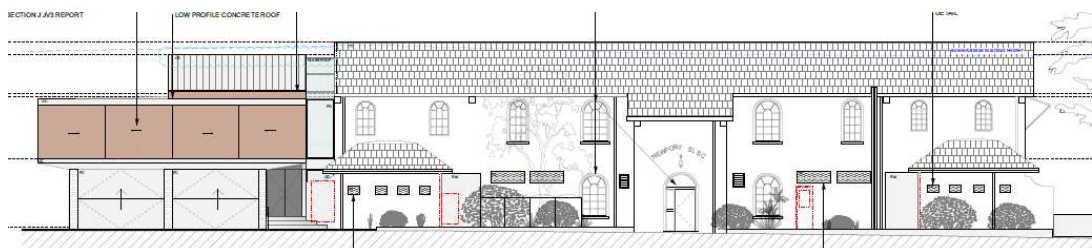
New northern addition utilizing a clearly contemporary architectural character, allowing the original Mediterranean aesthetic to remain clearly discernible. Minor additions to the single-story wings retain the existing roof lines without disruption. (Source: Adriano Pupilli Architect)
